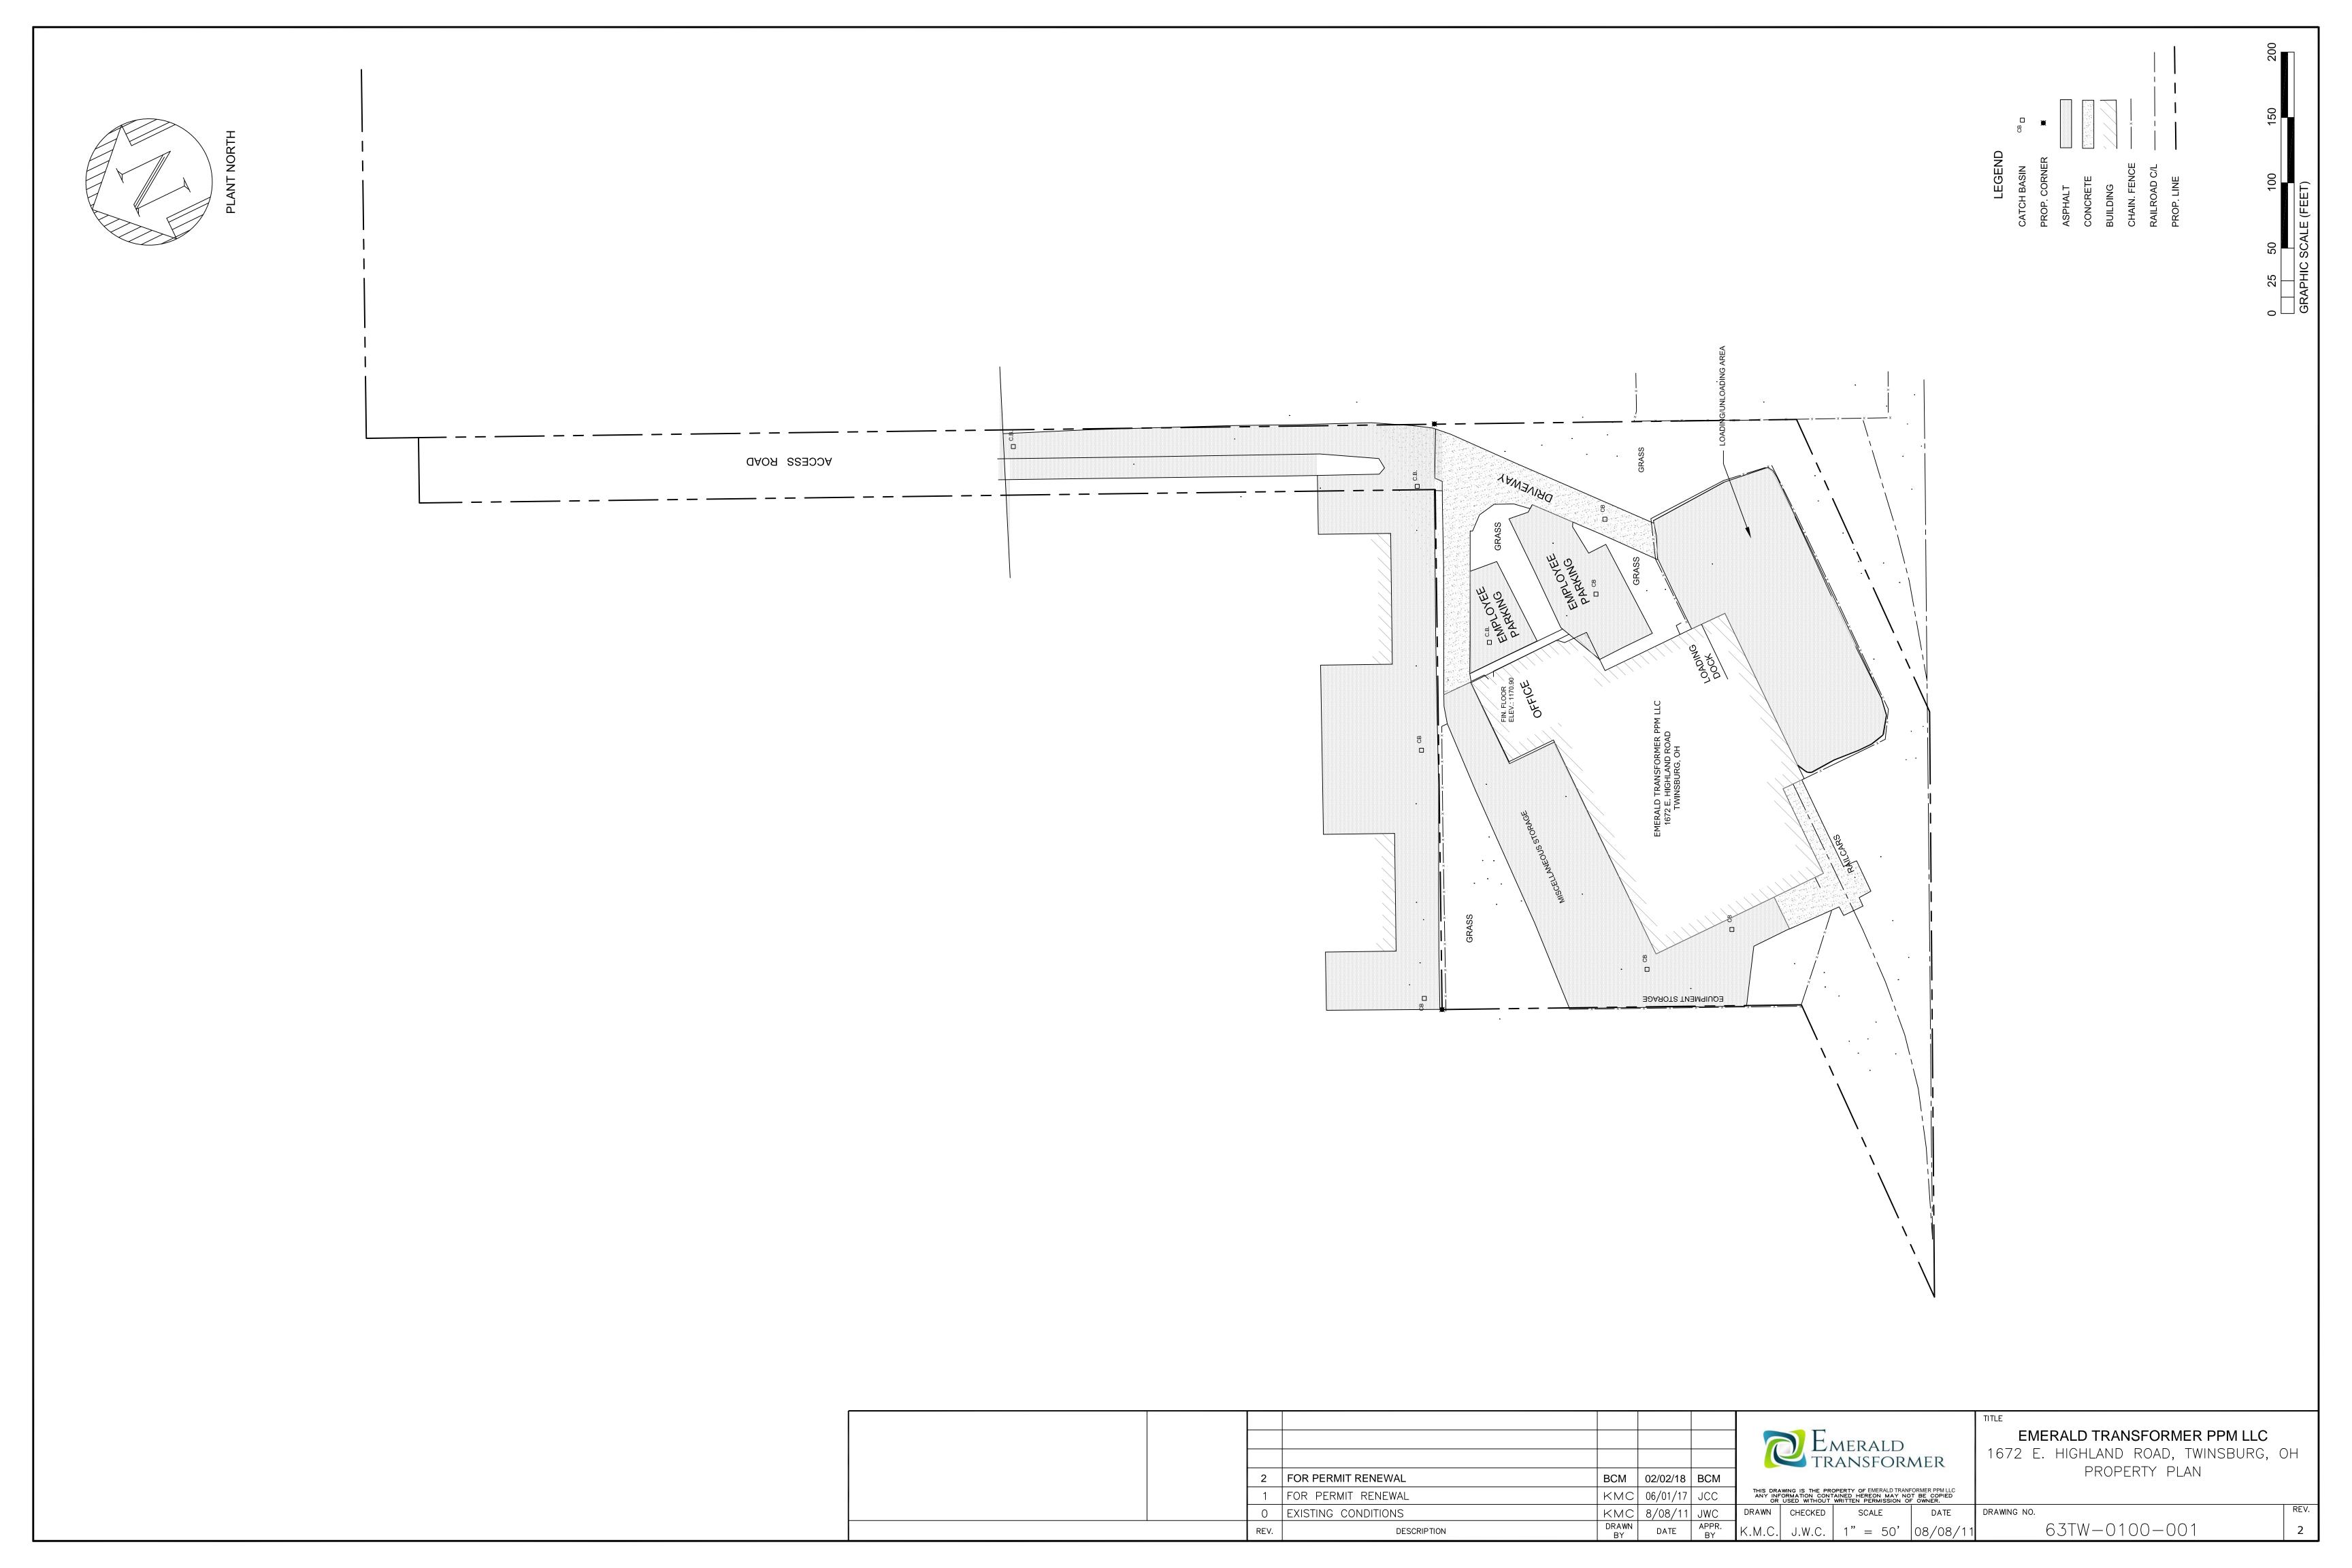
MAIN PROCESS BUILDING LAYOUT
